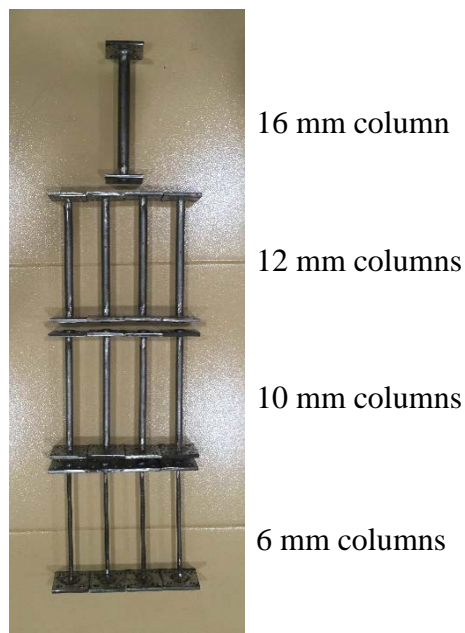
Column sizes to impose damage by column stiffness reduction
